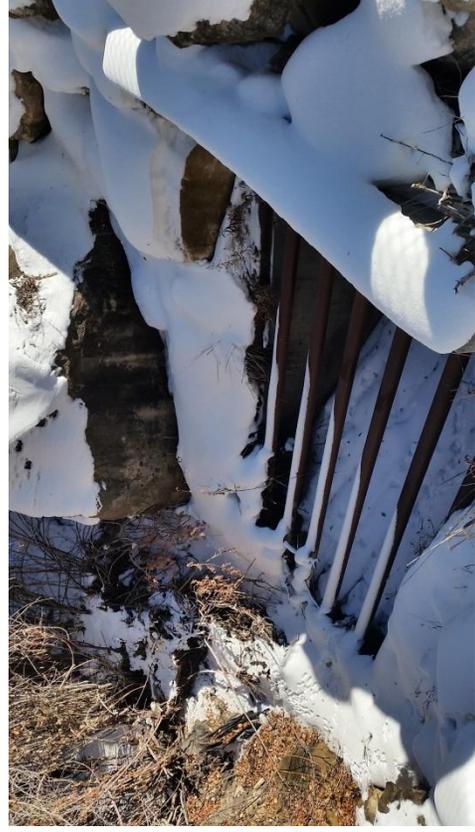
INTAKE CULVERT, MAIN SITE
